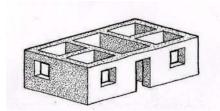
Perspective of a typical modest adobe dwelling. Cylindrical roof goes over rectangular center space, domes are used for the square rooms.
